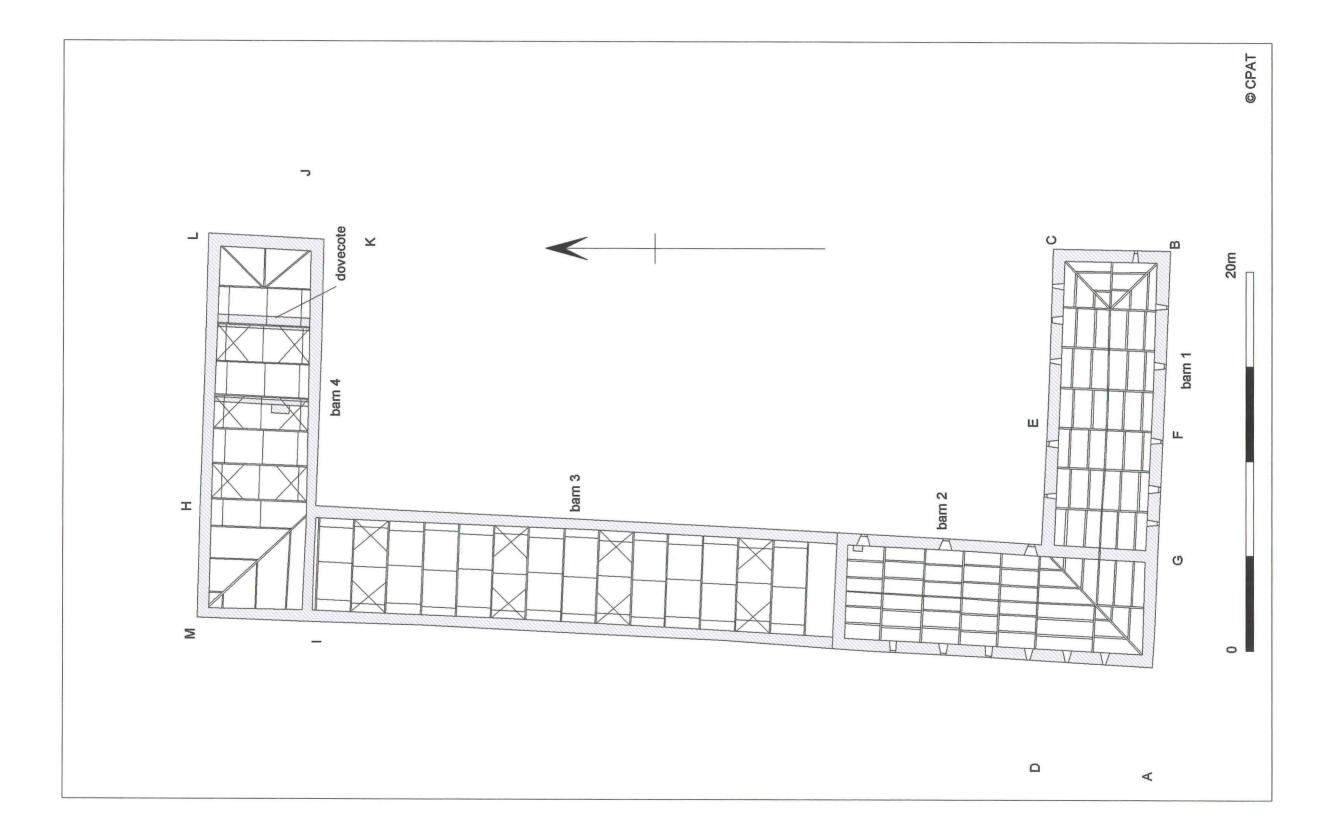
Roundhouse Farm barn complex, loft plan and roof structure
